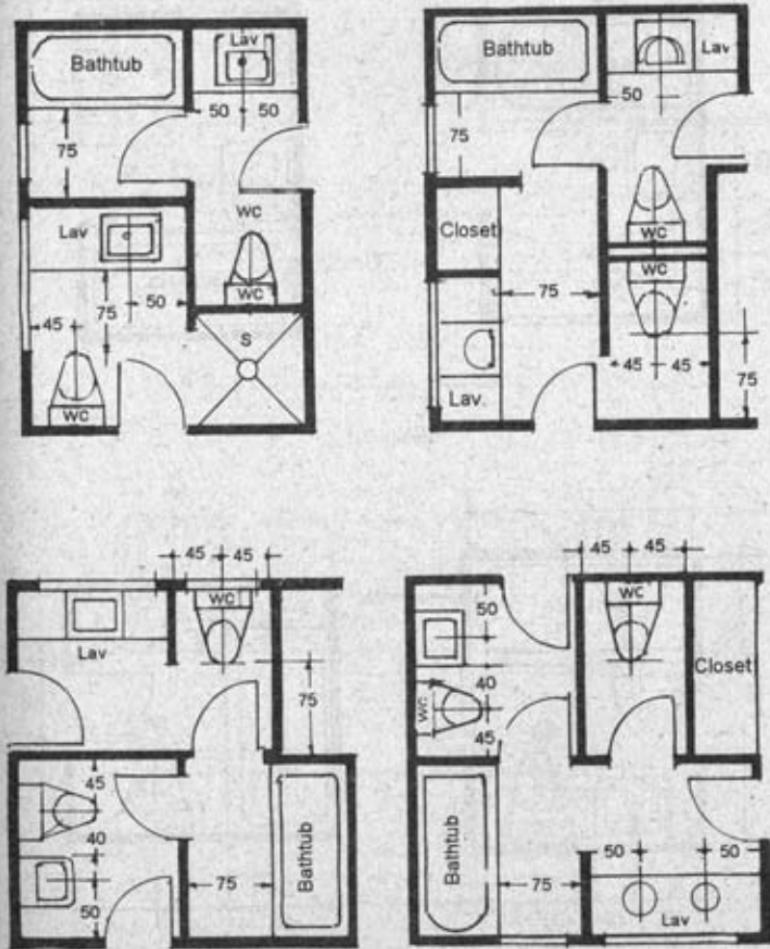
COMPARTMENTED TOILET PLAN
